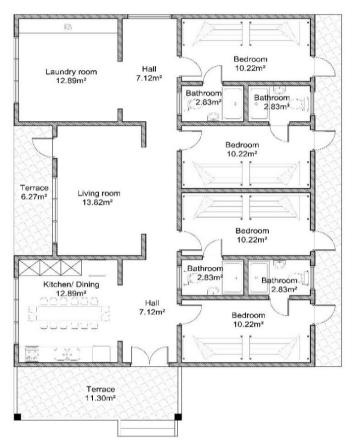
Plan of the single-storey building with 4 bedrooms.
